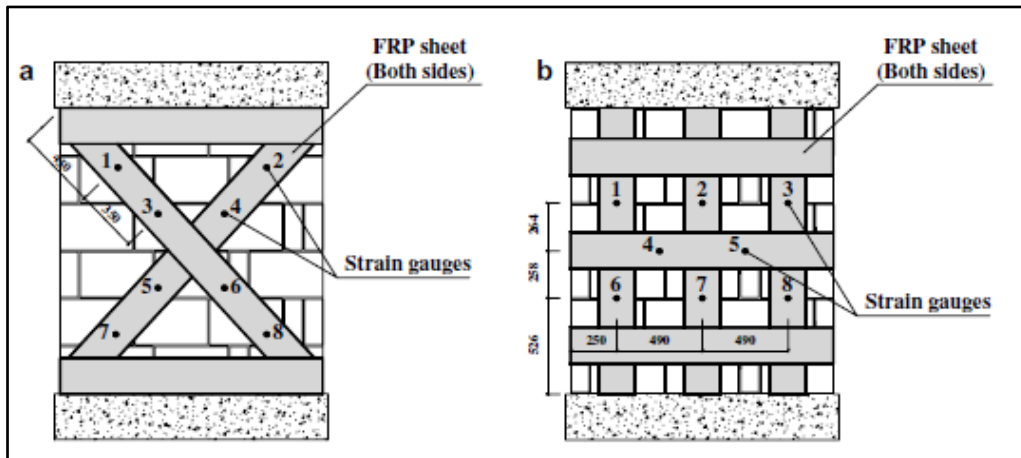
reinforcement layout : (a) cross layout and (b) grid layout [53]
